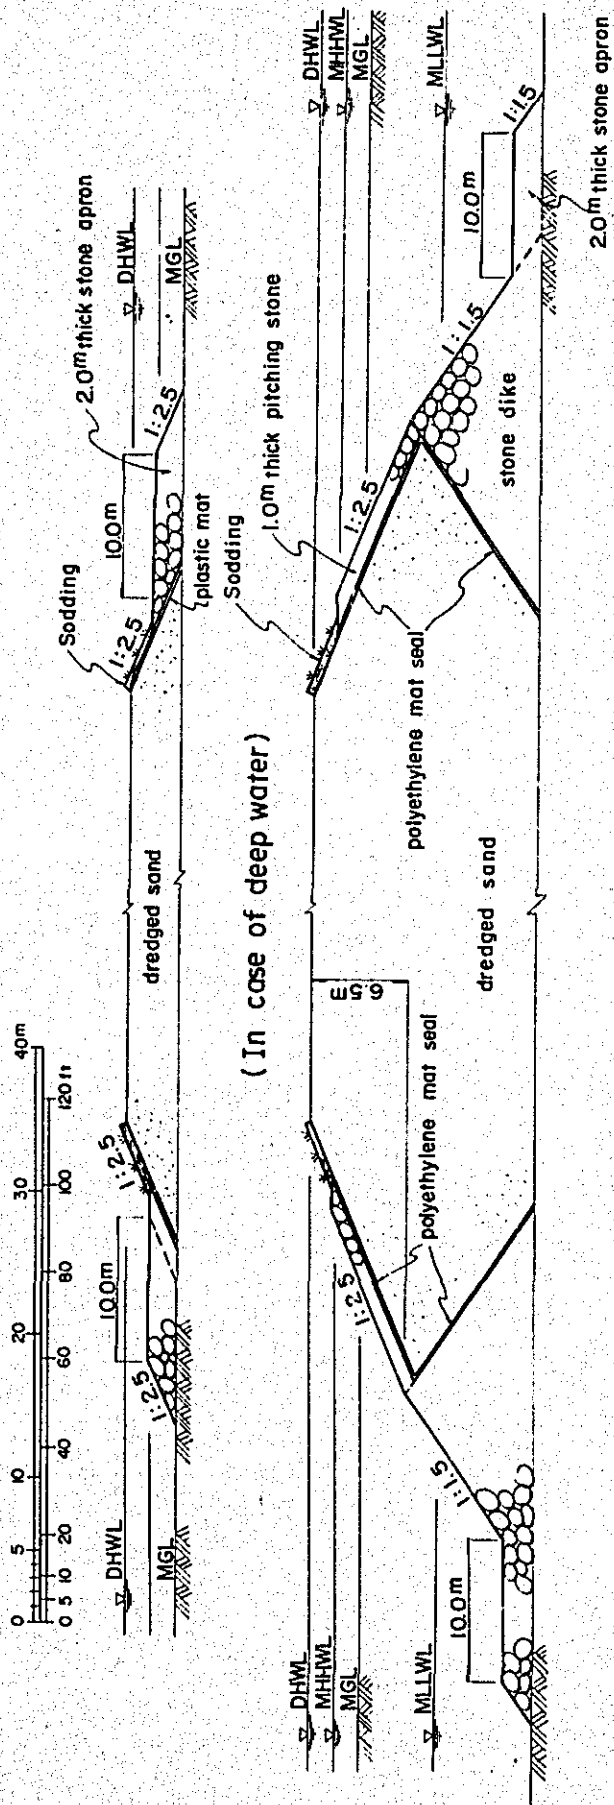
Standard Cross Section of Closing Dike (Scale 1/500)
